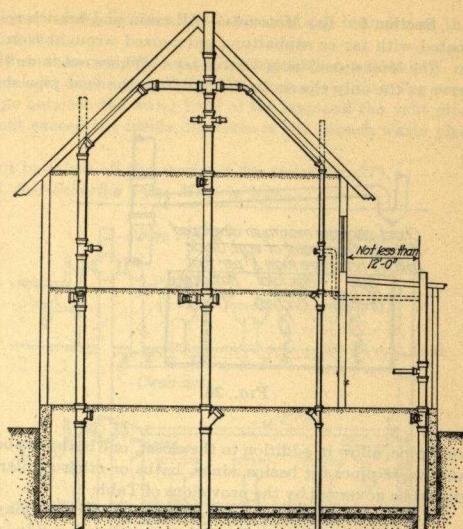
Method of connecting vent and joining of soil and waste pipe stacks.
